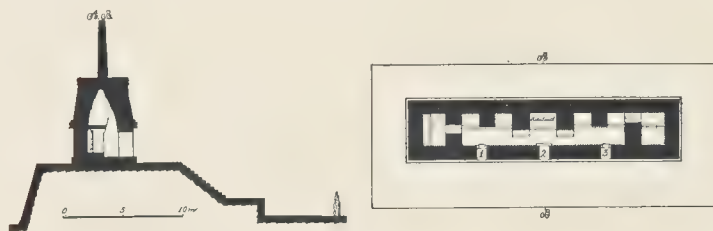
STRUCTURE 33, THE TEMPLE OF KETSALKOATL: SECTION AND GROUND-PLAN (RESTORED)
